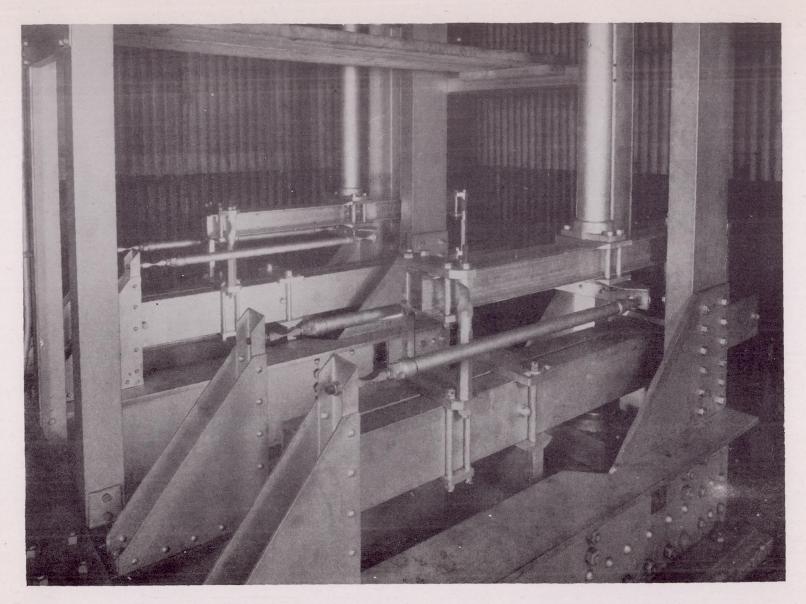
Beam fatigue tests of spot welded girders made of 61S-T sheet 1/8 inch thick.
